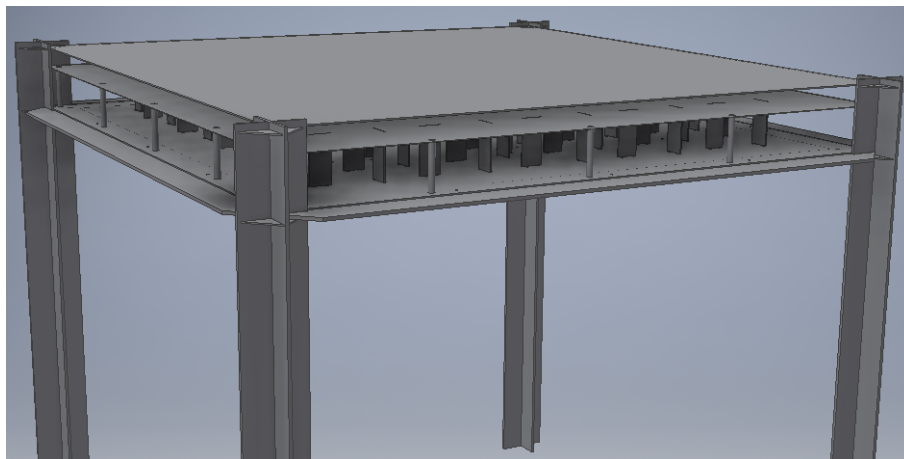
The top-view of the CAD geometry of the enclosure with the DDA.
